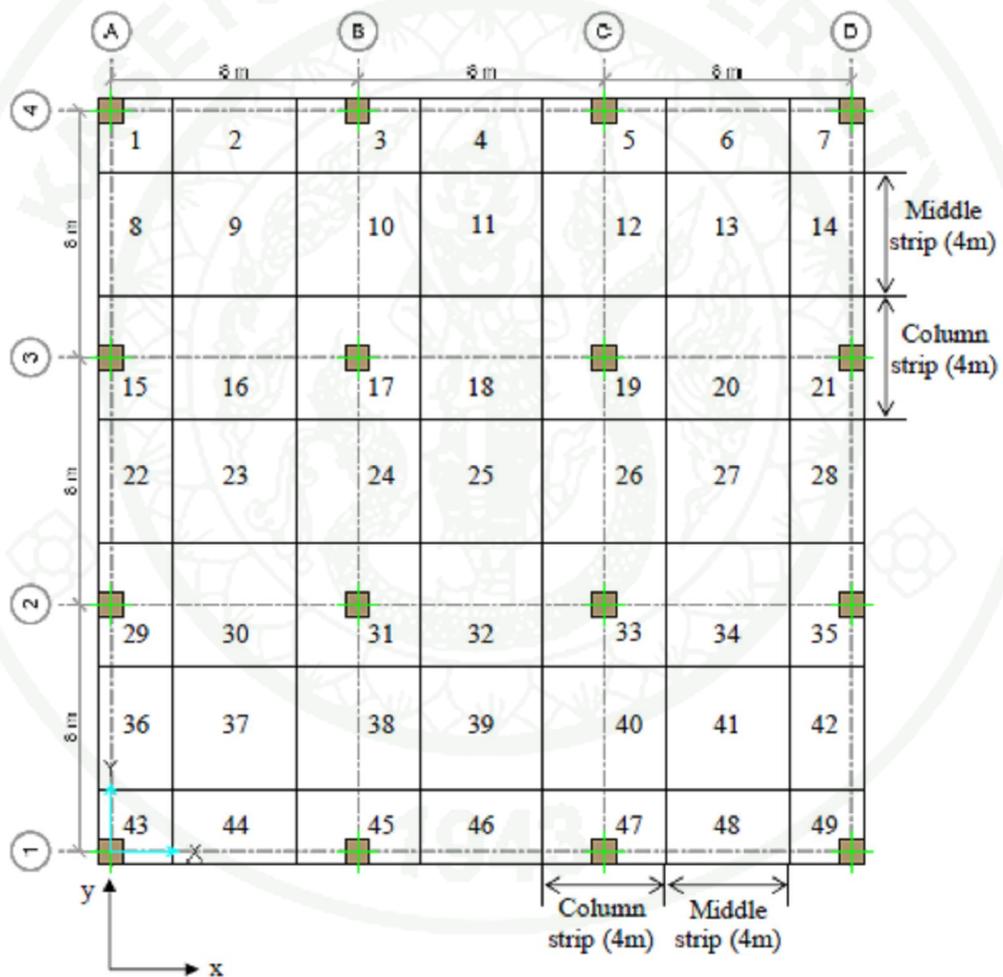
Plan of flat plate model (without opening) divided into the 49 areas
